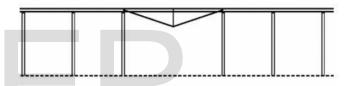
Eliminating a certain intermediate pier with maintaining the uniform span distribution and the main characteristic of the bridge deck using under deck cable staying system [3].
